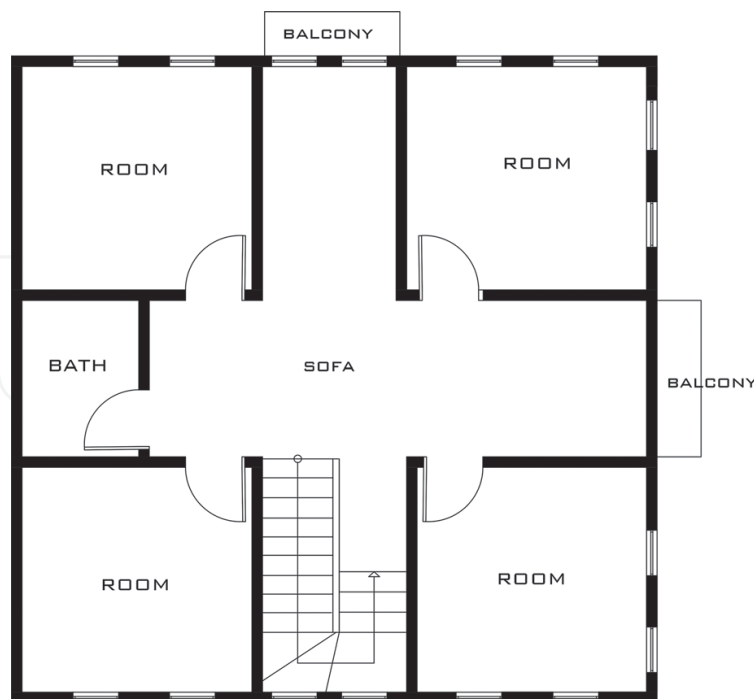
Ground floor plan of Suzan Şimşek house.
